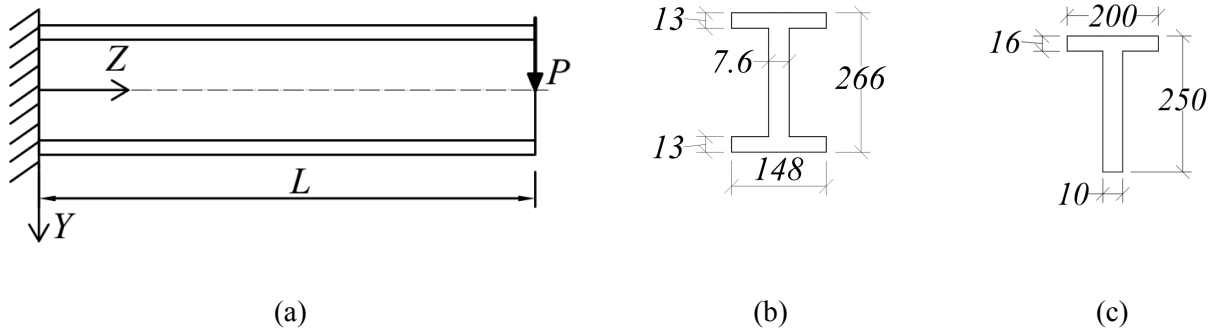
Cantilever steel beams under point load at the tip (a) Elevation, (b) cross-sectional dimensions for W250x45 (mm) and (c) cross-sectional dimensions for WT250x200 (mm)
